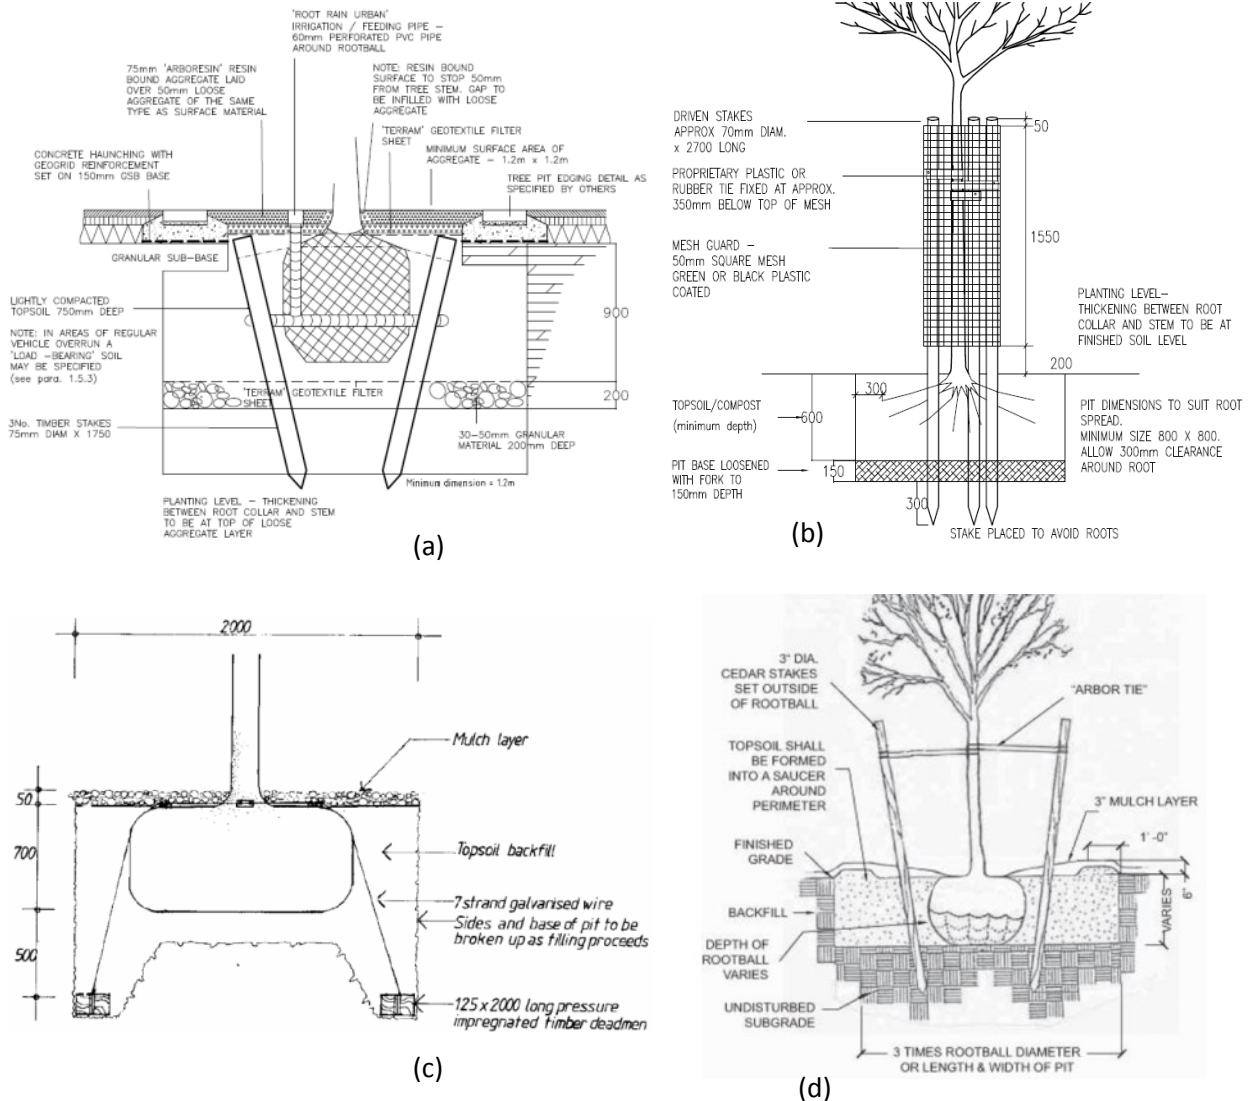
Tree Pit Details (Source; Bloomberg & Benepe, 2008)
